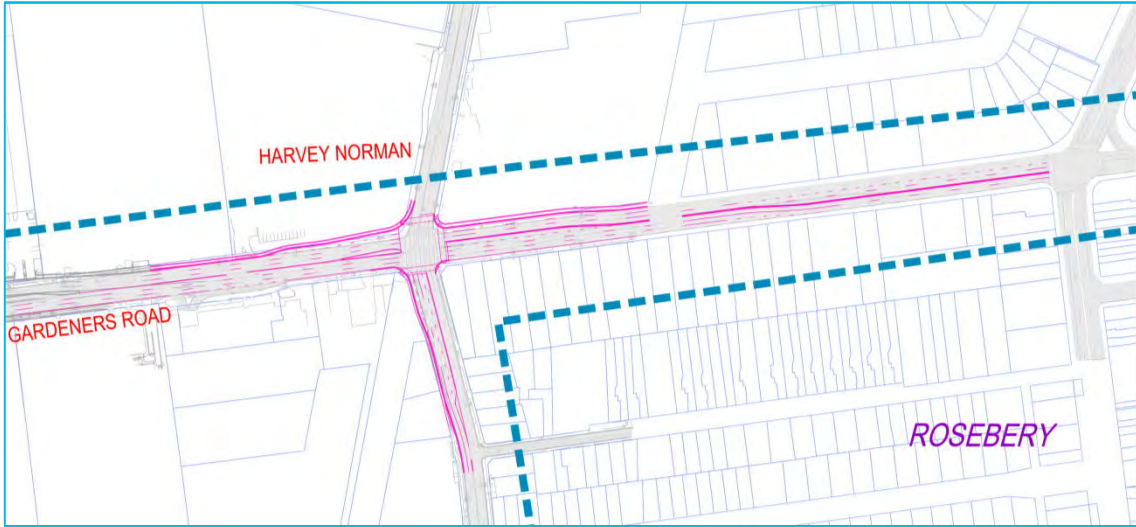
Mascot Town Centre Precinct changes – Gardeners Road/O’Riordan Street and Gardeners Road/Botany Road
